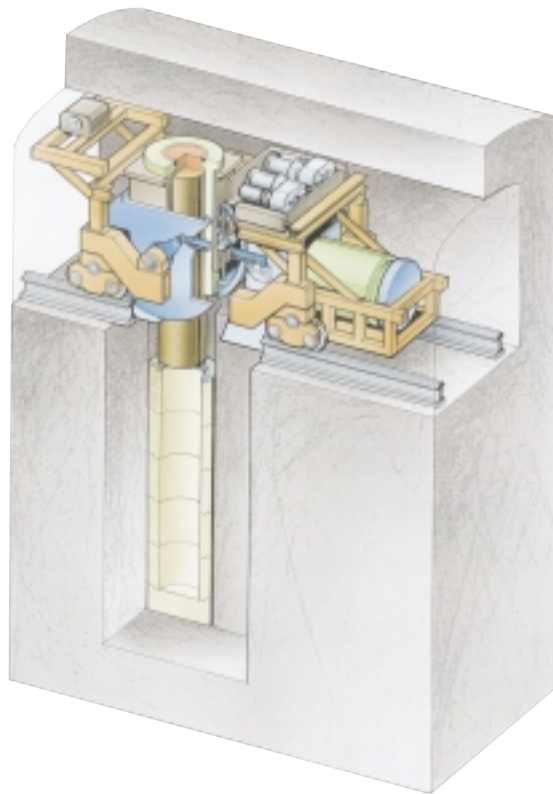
Schematic drawing of the deposition machine that will be tested in the Äspö HRL.
